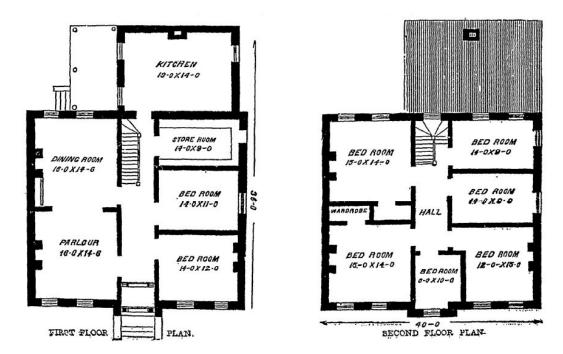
Floor plan as presented in Canada Farmer Vol. 2 No. 8 1865
